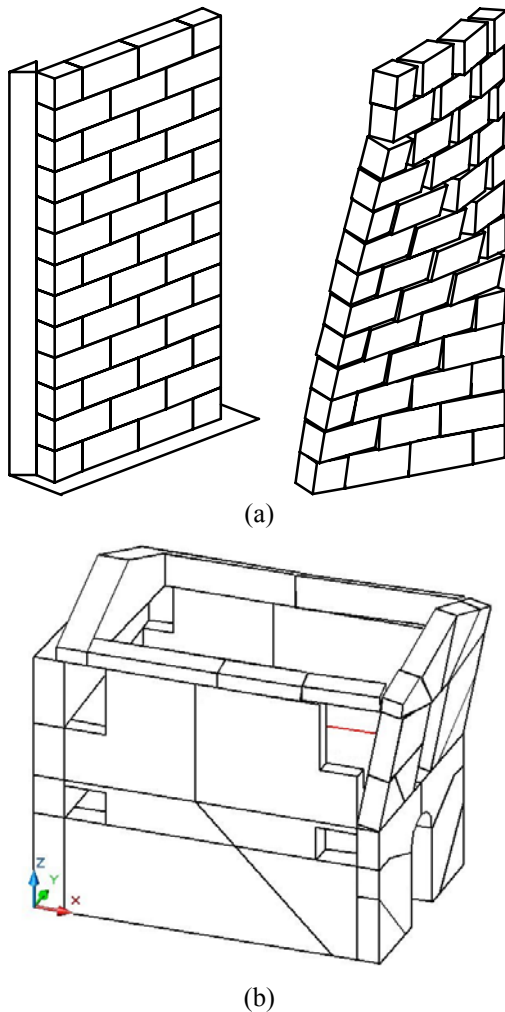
Application of limit analysis of blocky masonry structures to: (a) masonry wall with out of plane failure; (b) masonry building subjected to seismic loading.
